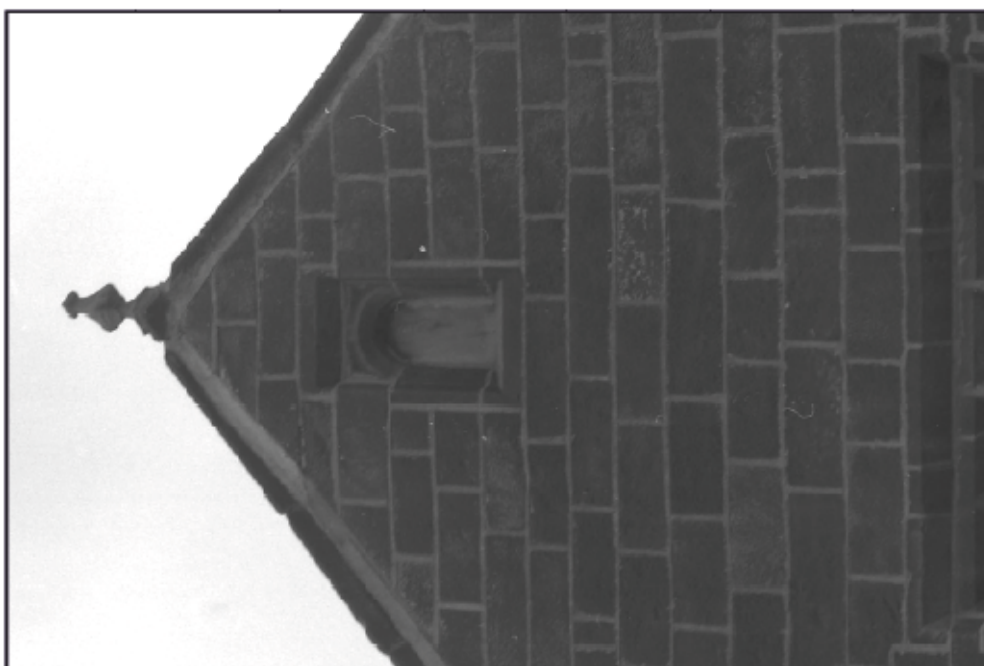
Detail of blind niche in north elevation of west wing (film 1.32)
